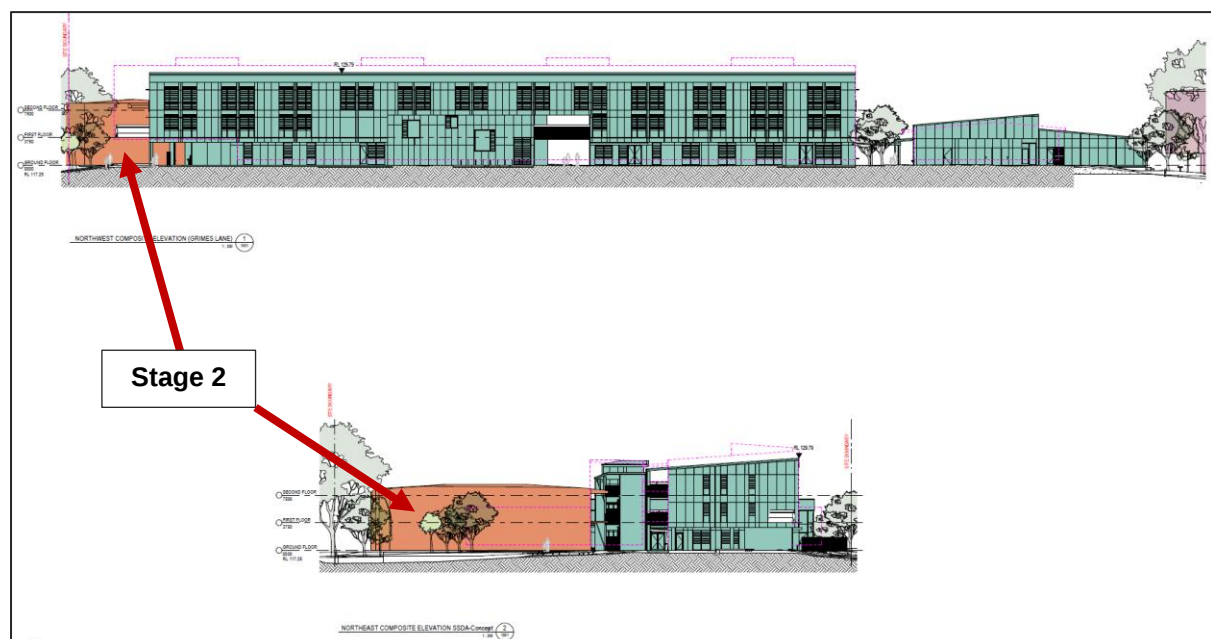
| Stage 2 north-east elevation (Source: Applicant's RtS 2021)
